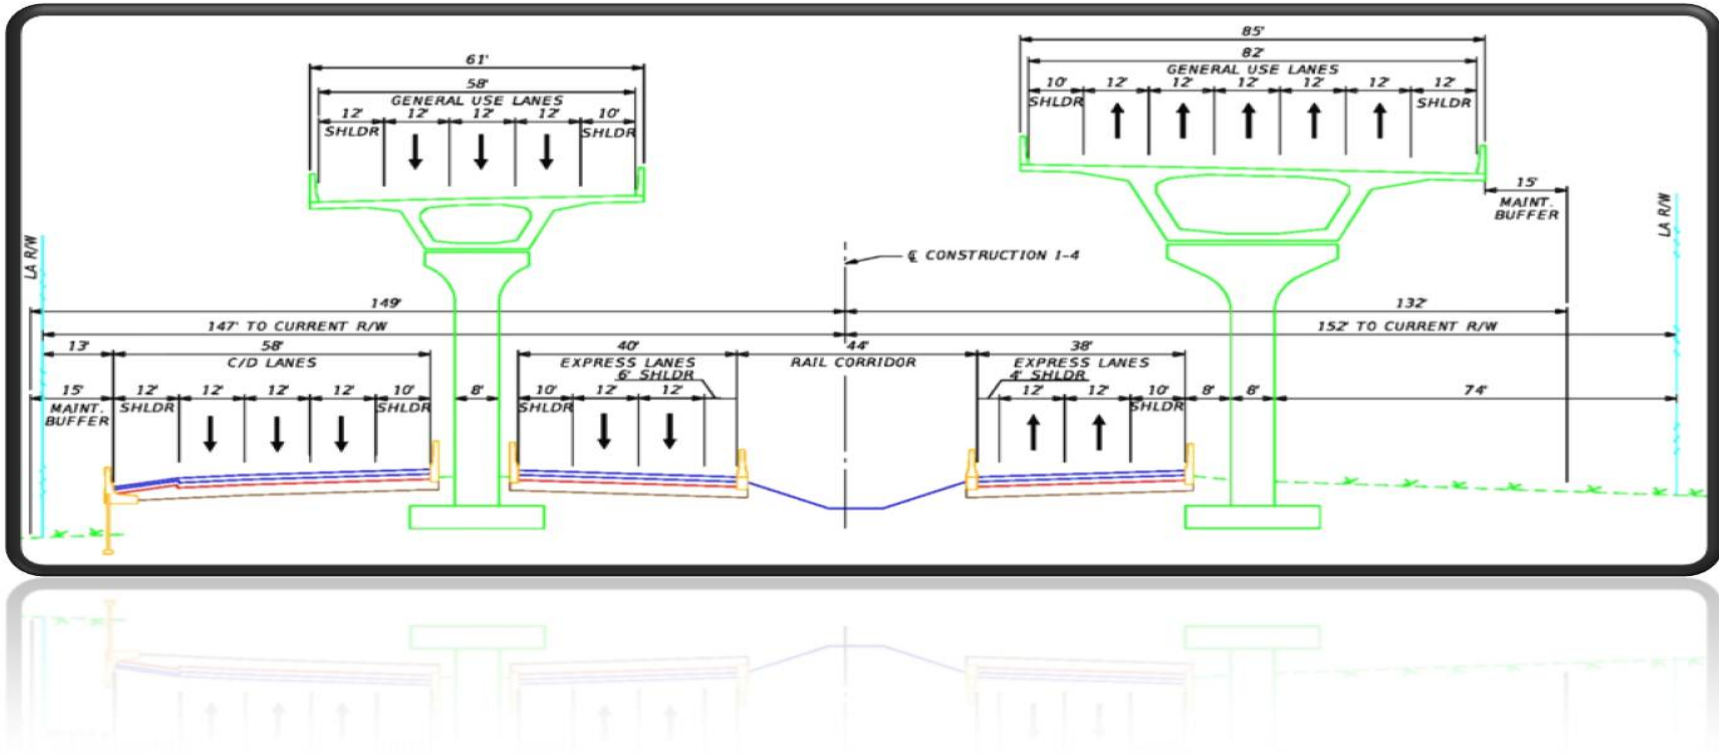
SR 400 (I-4) Segment 1 Proposed Typical Section (elevated EB and WB GUL Lanes between SR 536 and SR 535)
